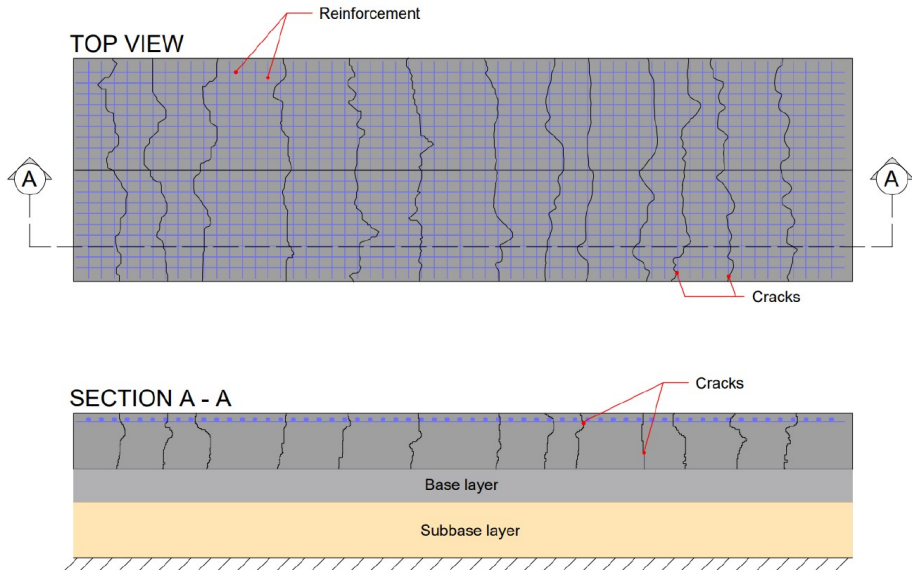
Top and sectional view of continuously reinforced concrete pavement.
